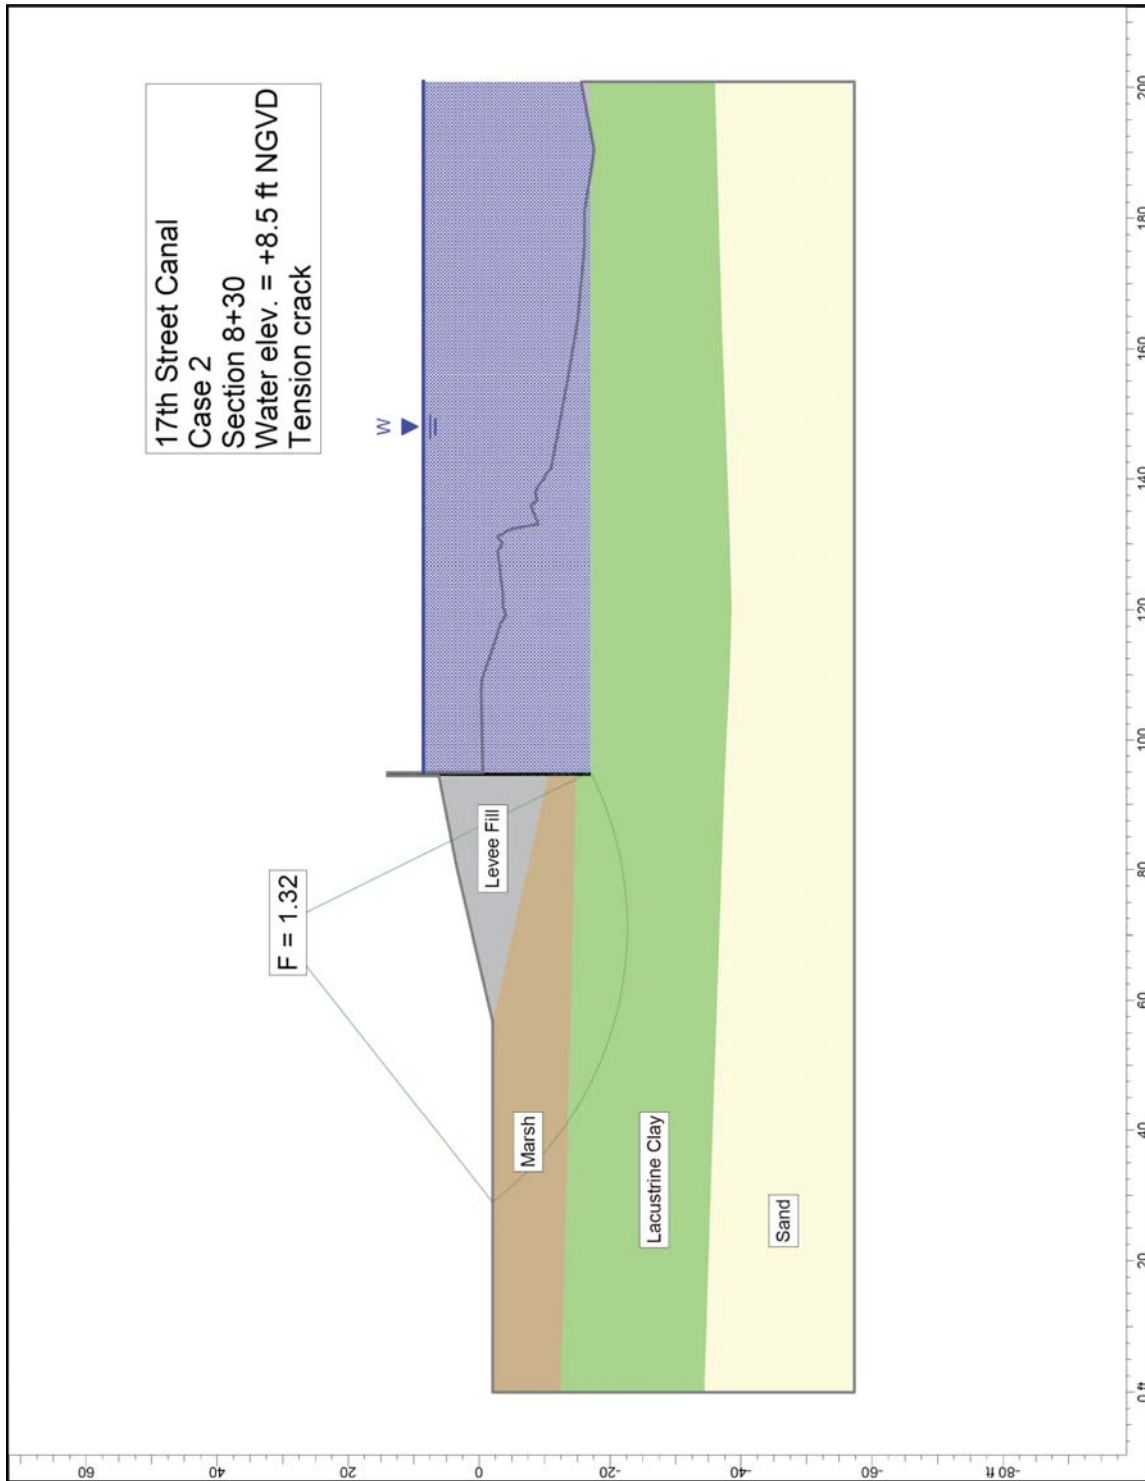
Critical circle for 17th Street Canal Station 8+30 – water elevation 8.5 ft, tension crack.
